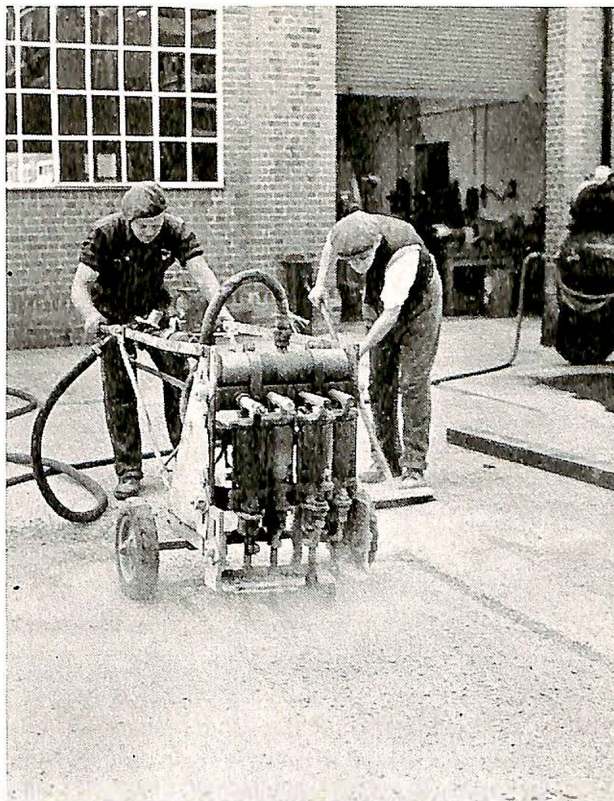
Patching of spalled areas, — preparing the damaged areas by pneumatic bush hammers.
